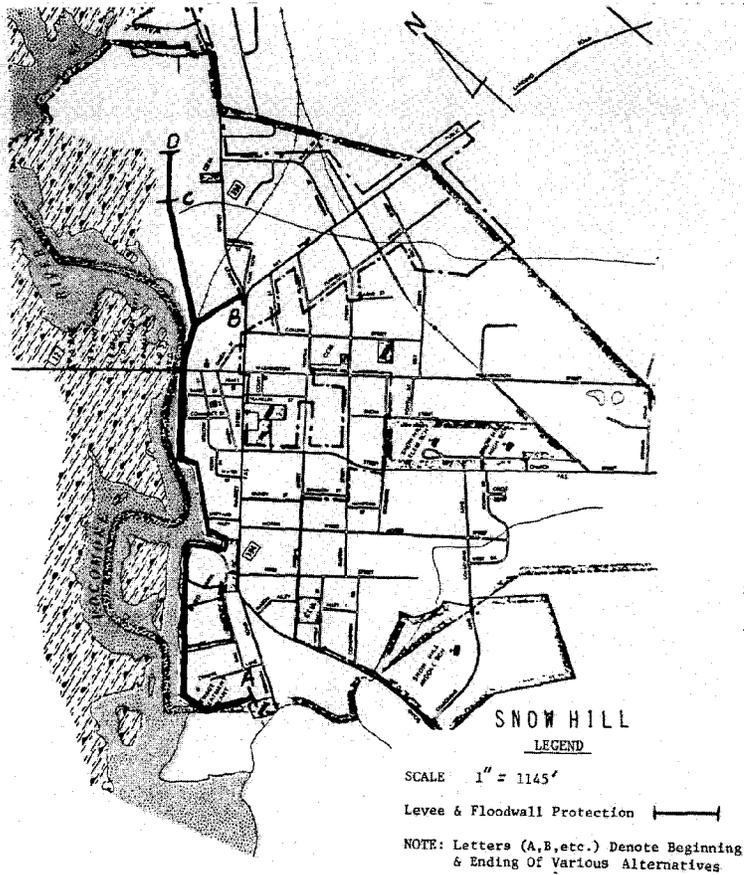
SNOW HILL PLANS OF IMPROVEMENT
